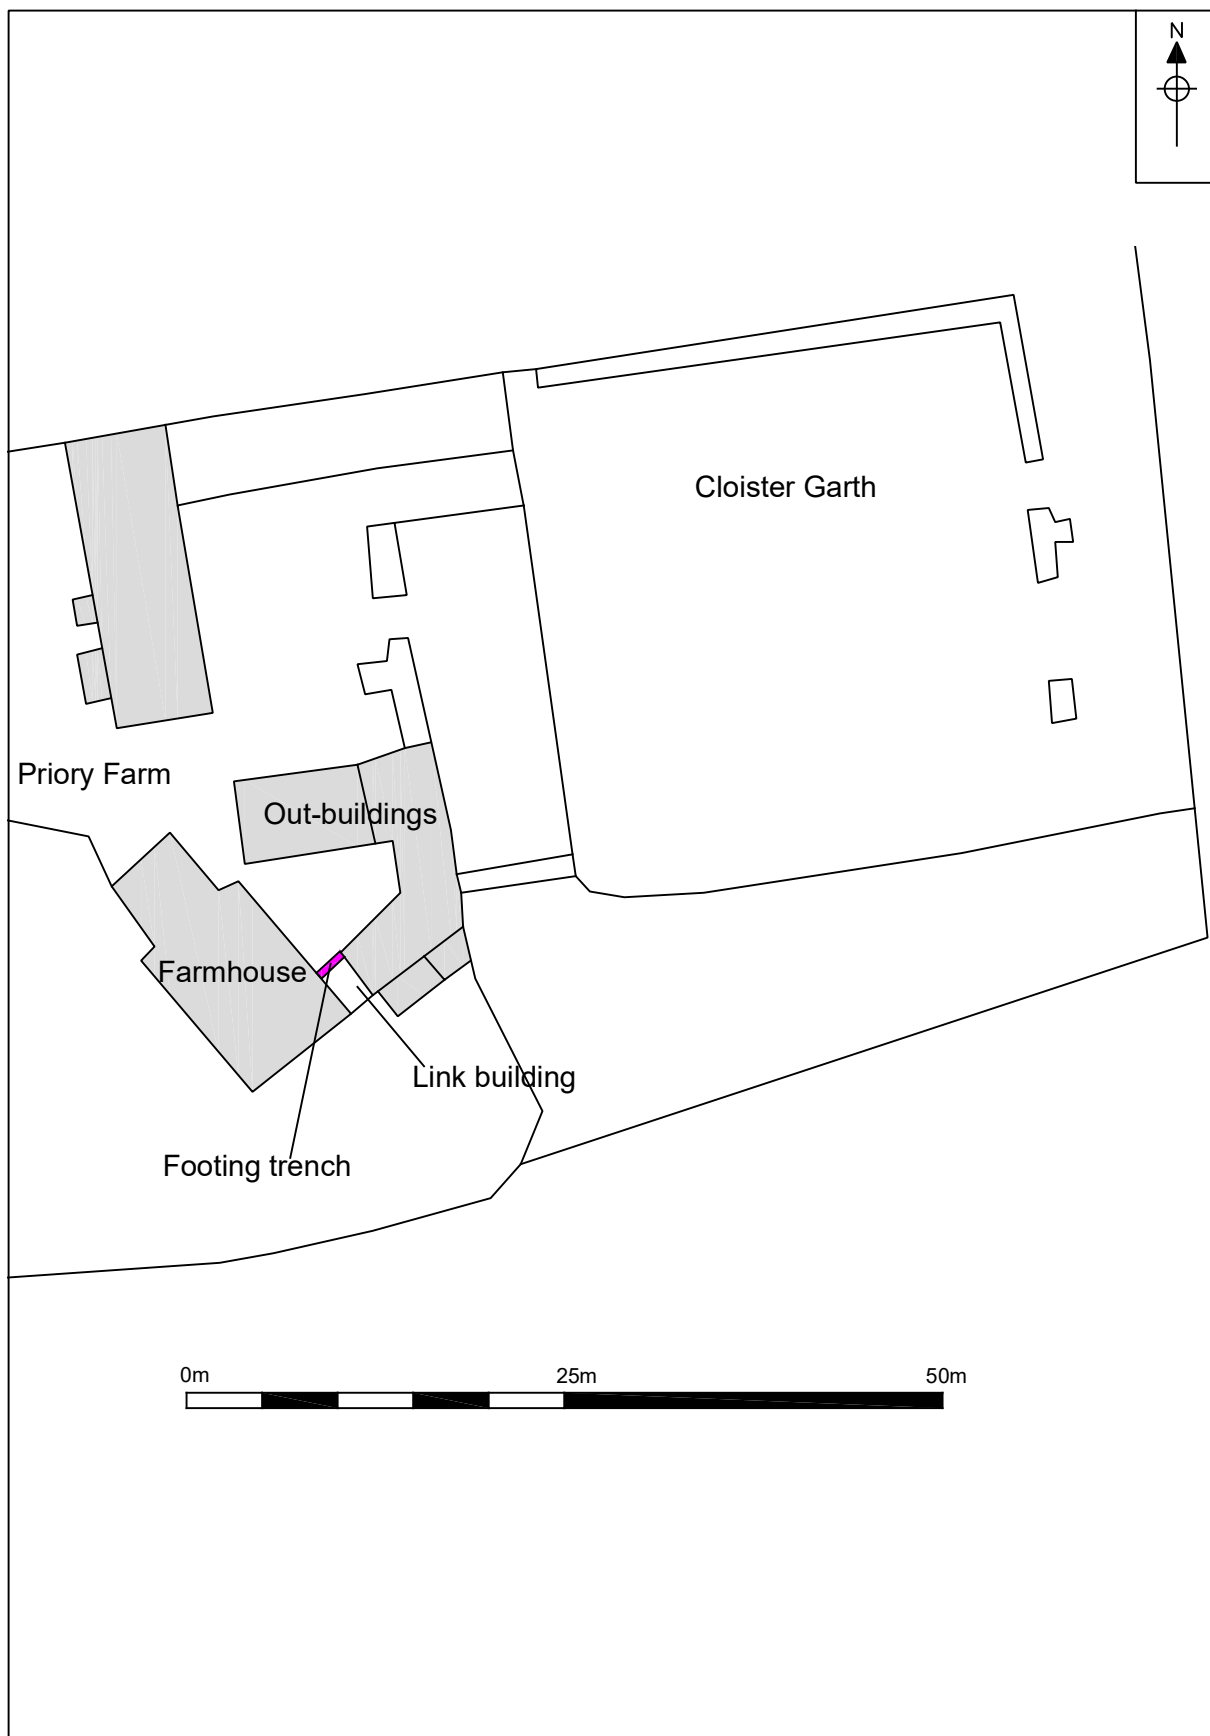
Priory Farm showing location of footing trench. Scale 1:500.
